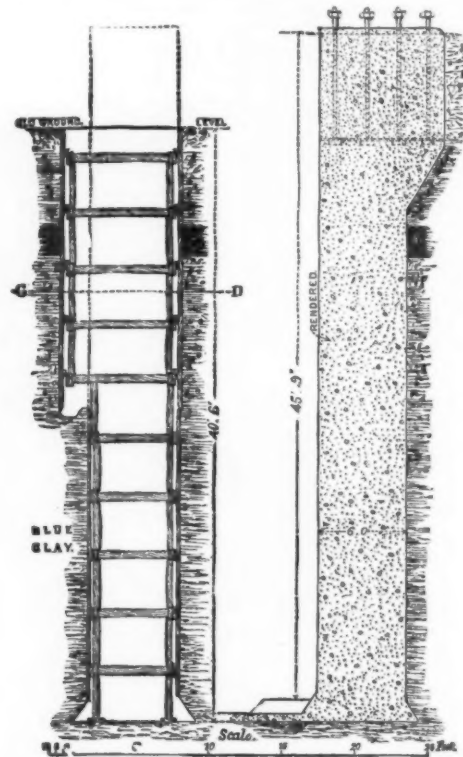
SECTIONS OF TRENCH AND PIER.
